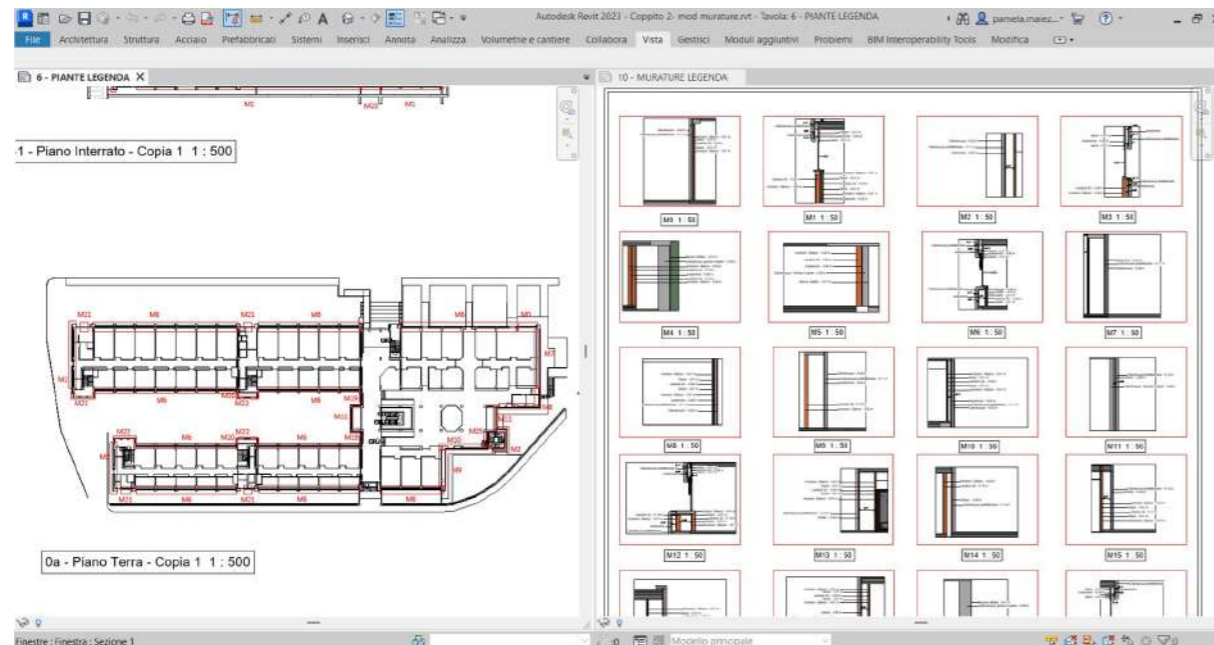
Construction details of Coppito 2 and respective plan indication within the BIM environment.
